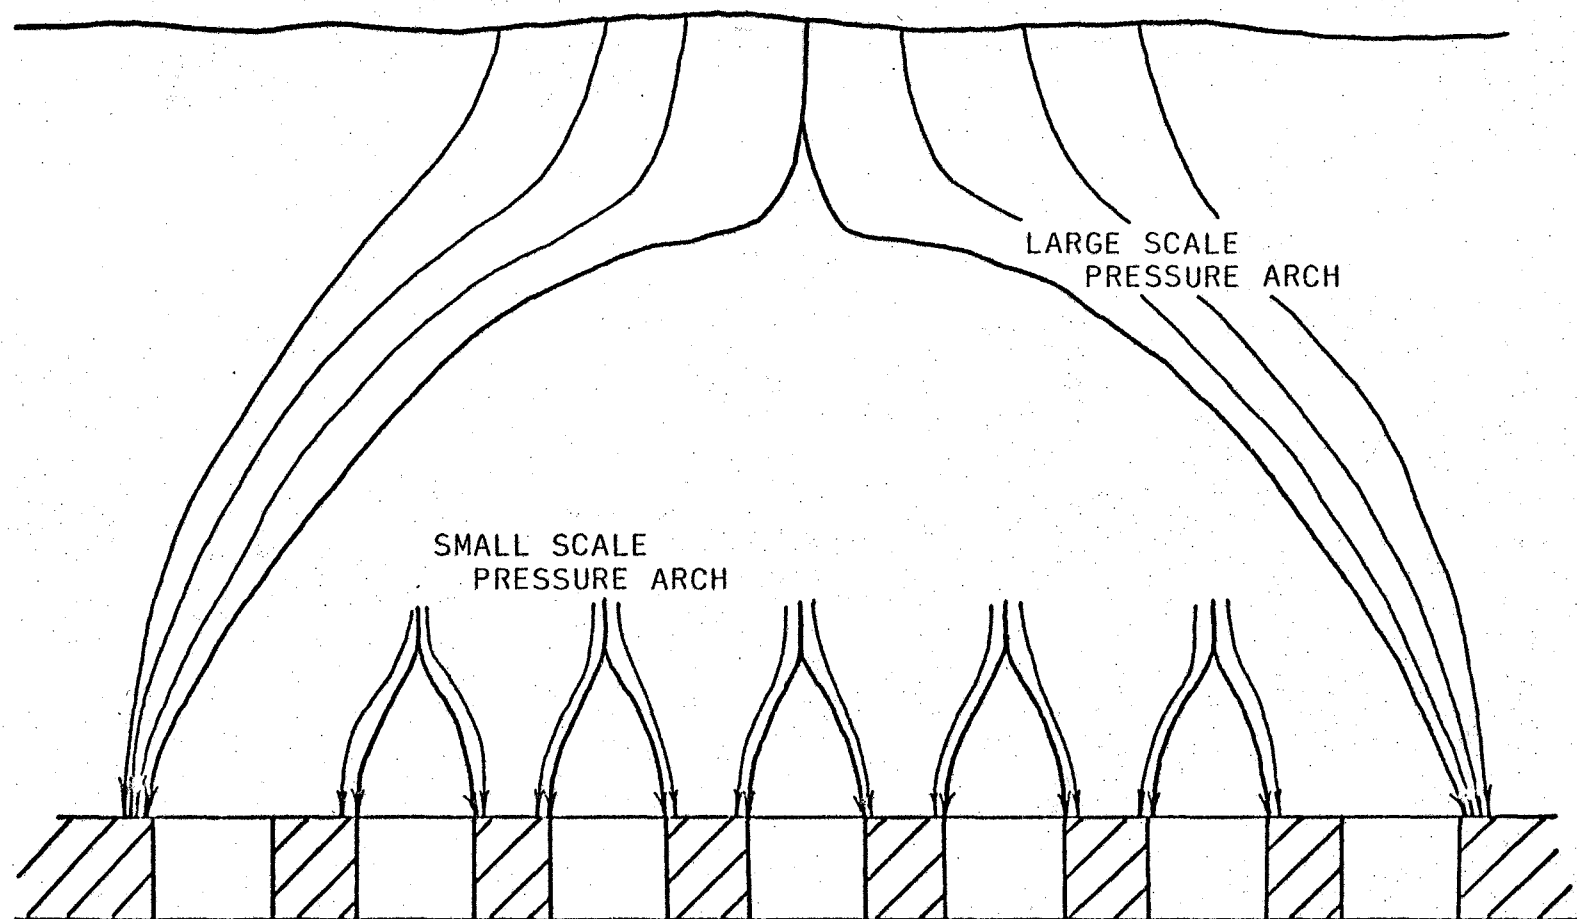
Proposed pressure arches formed in a room-and-pillar design
